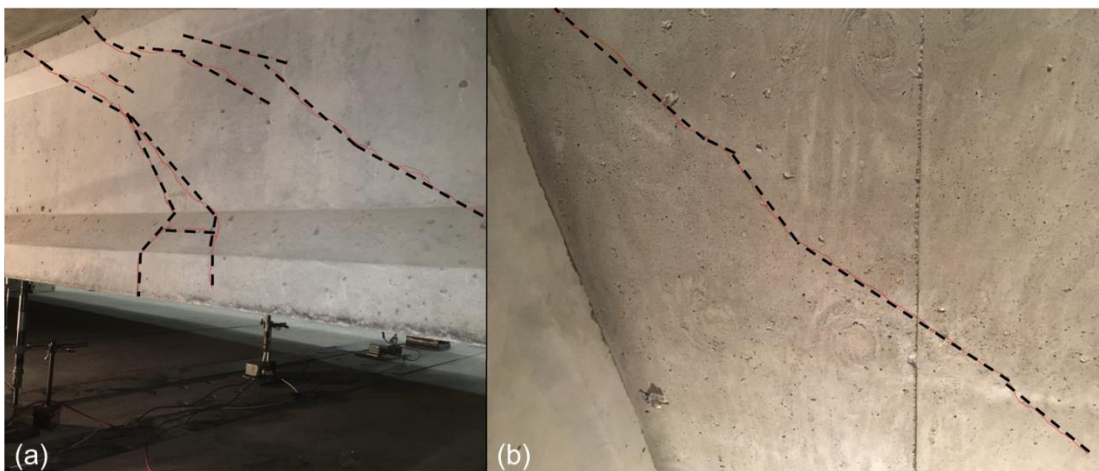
Bond shear crack in the loaded girder (left) and diagonal crack in slab (right)
